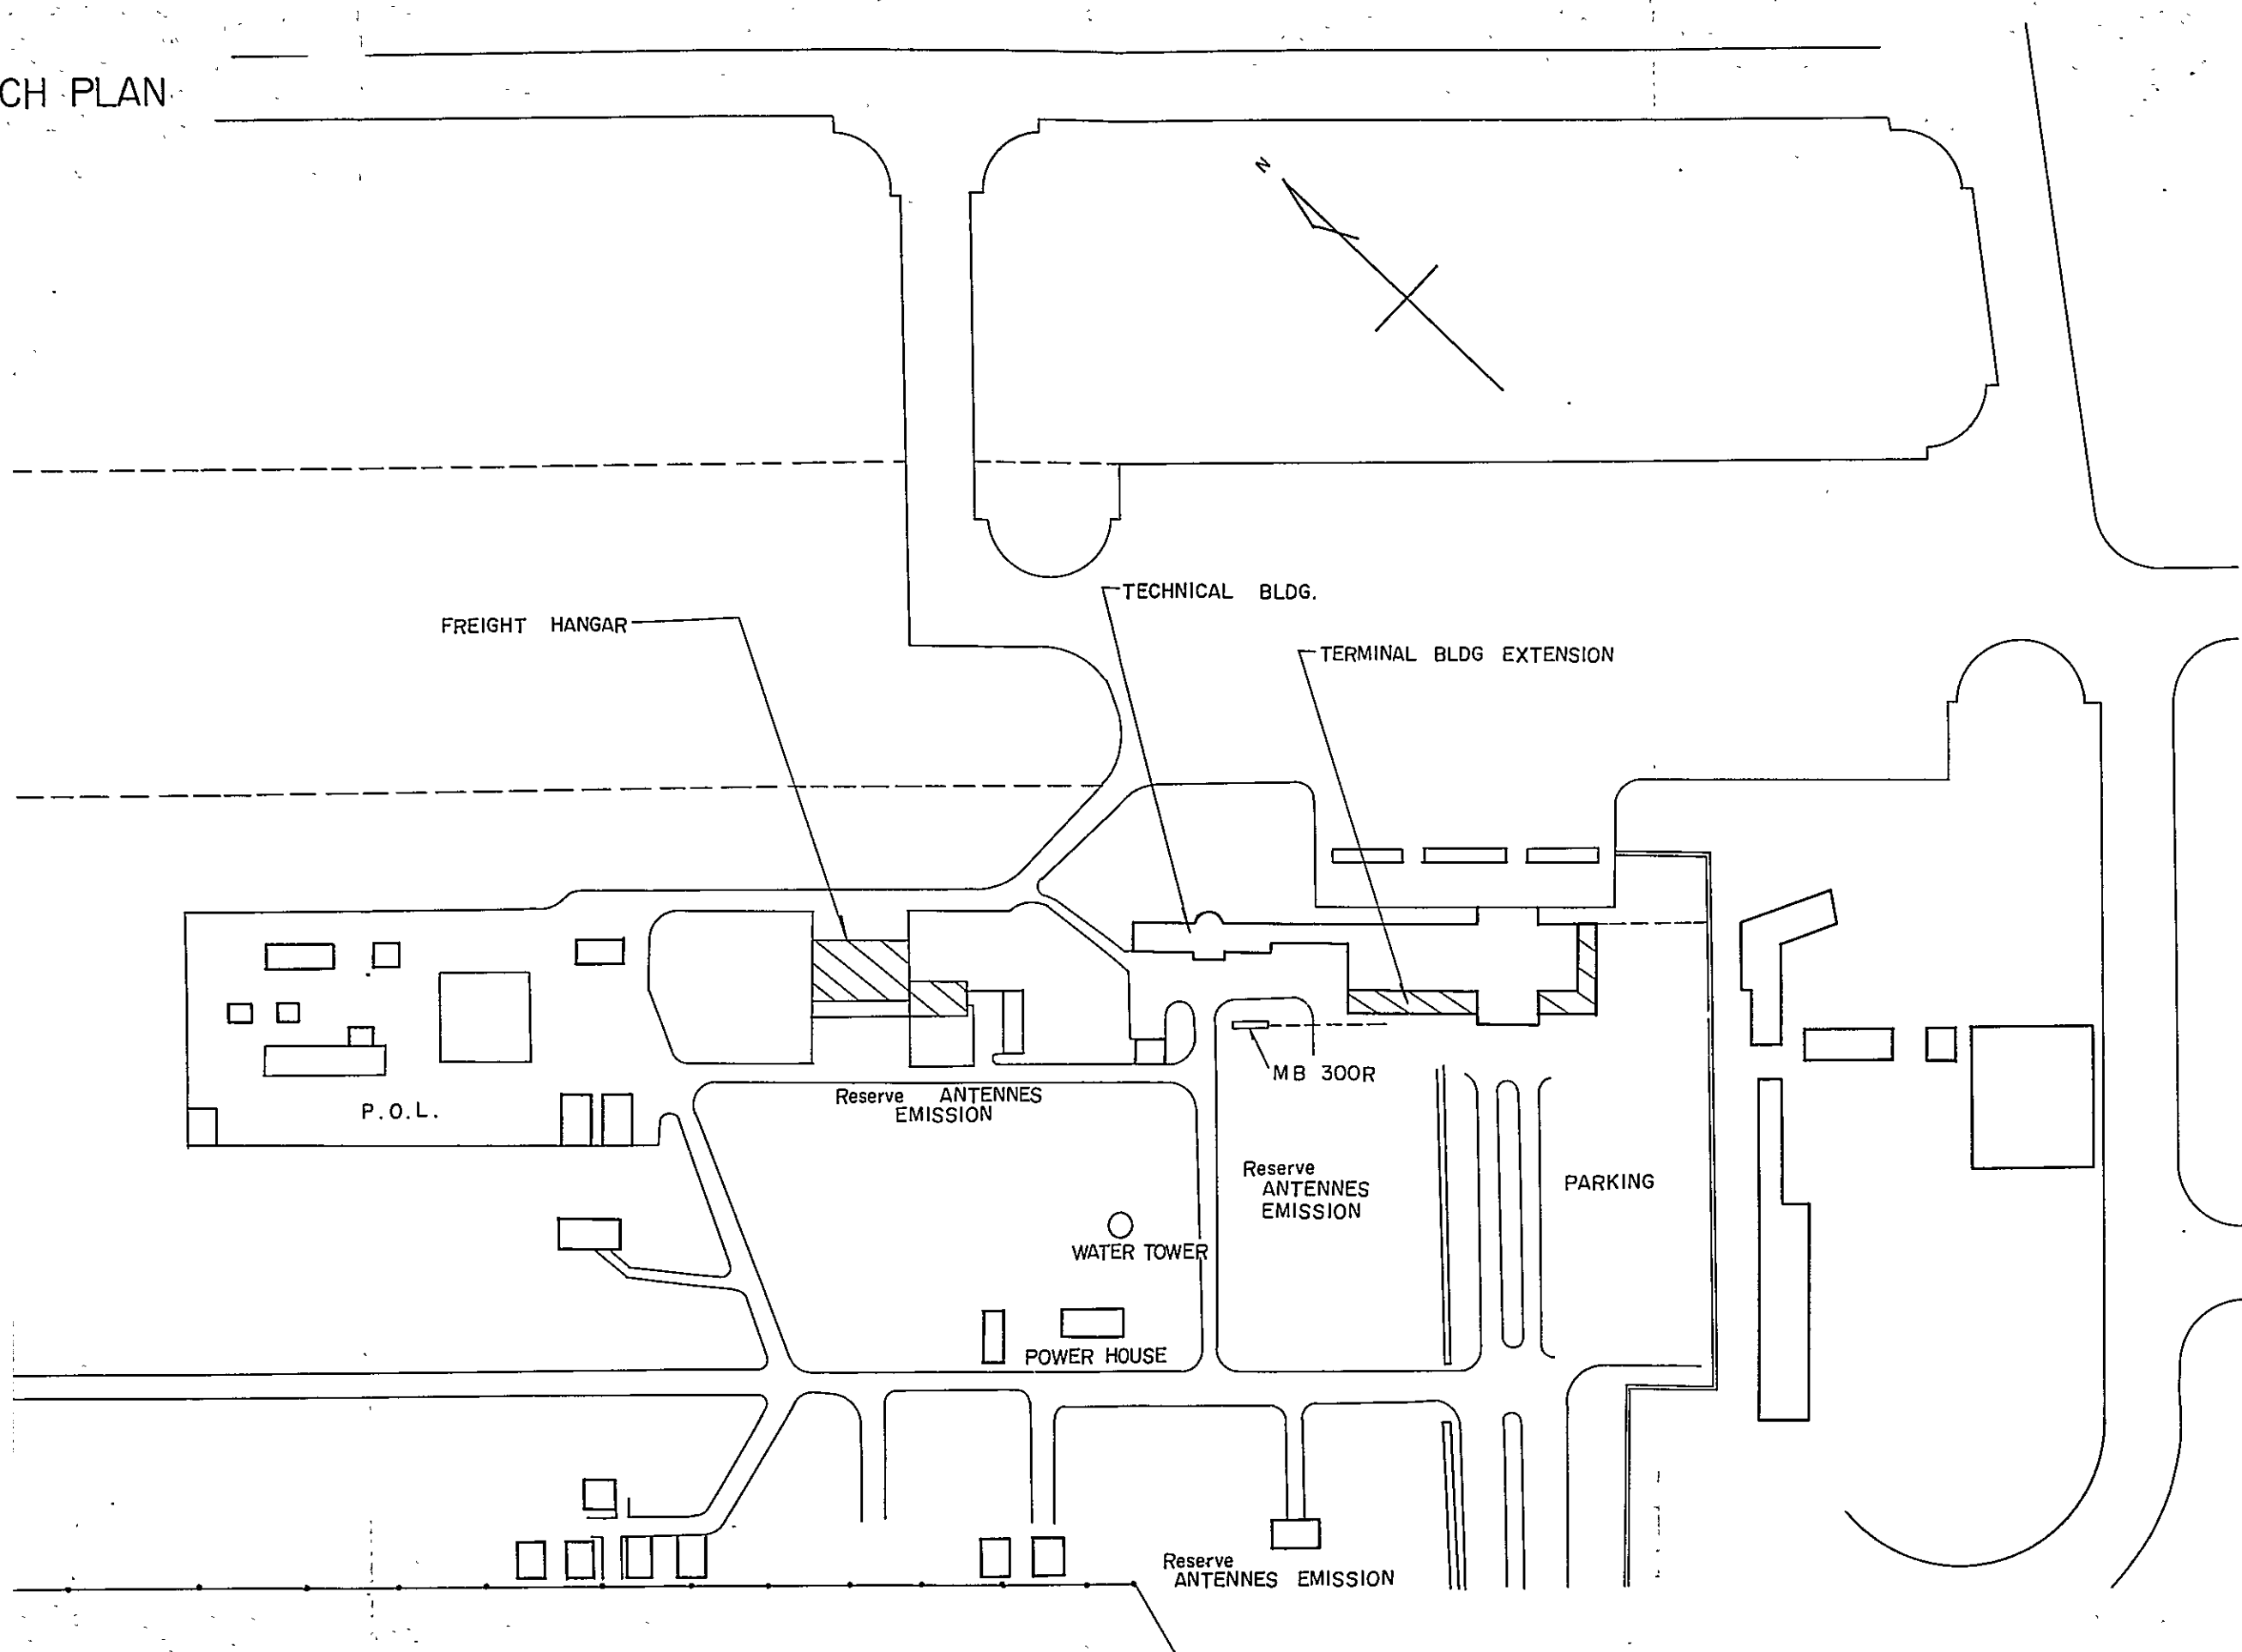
TERMINAL AREA FRENCH PLAN
